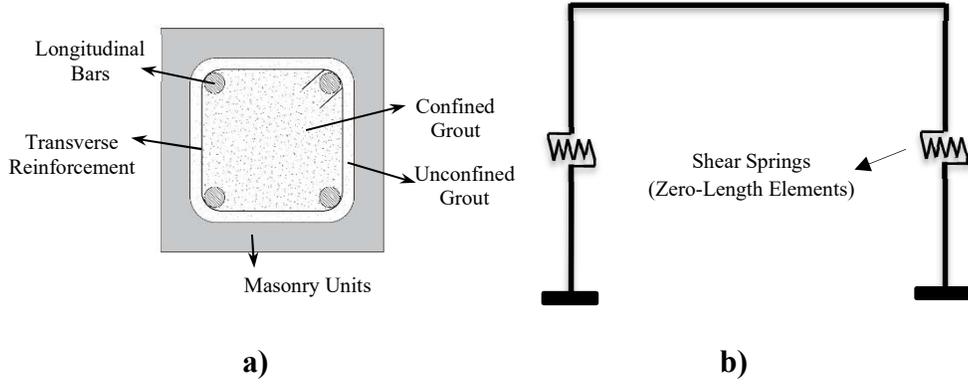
a) Cross-section of a reinforced masonry frame element, b) Proposed model for masonry frame
